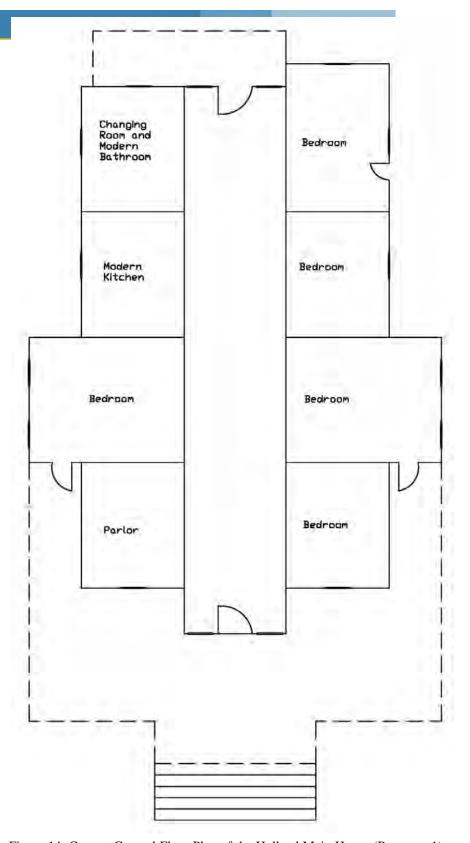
Current General Floor Plan of the Holland Main House (Resource 1). Drawn by: Jaime Destefano of History, Inc.
